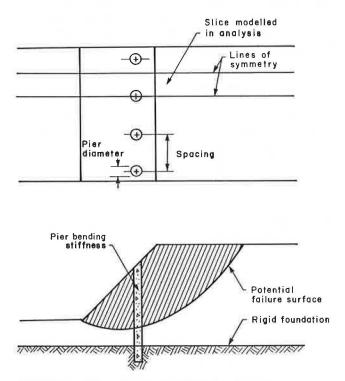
Discretely placed drilled piers for slope stabilization.
